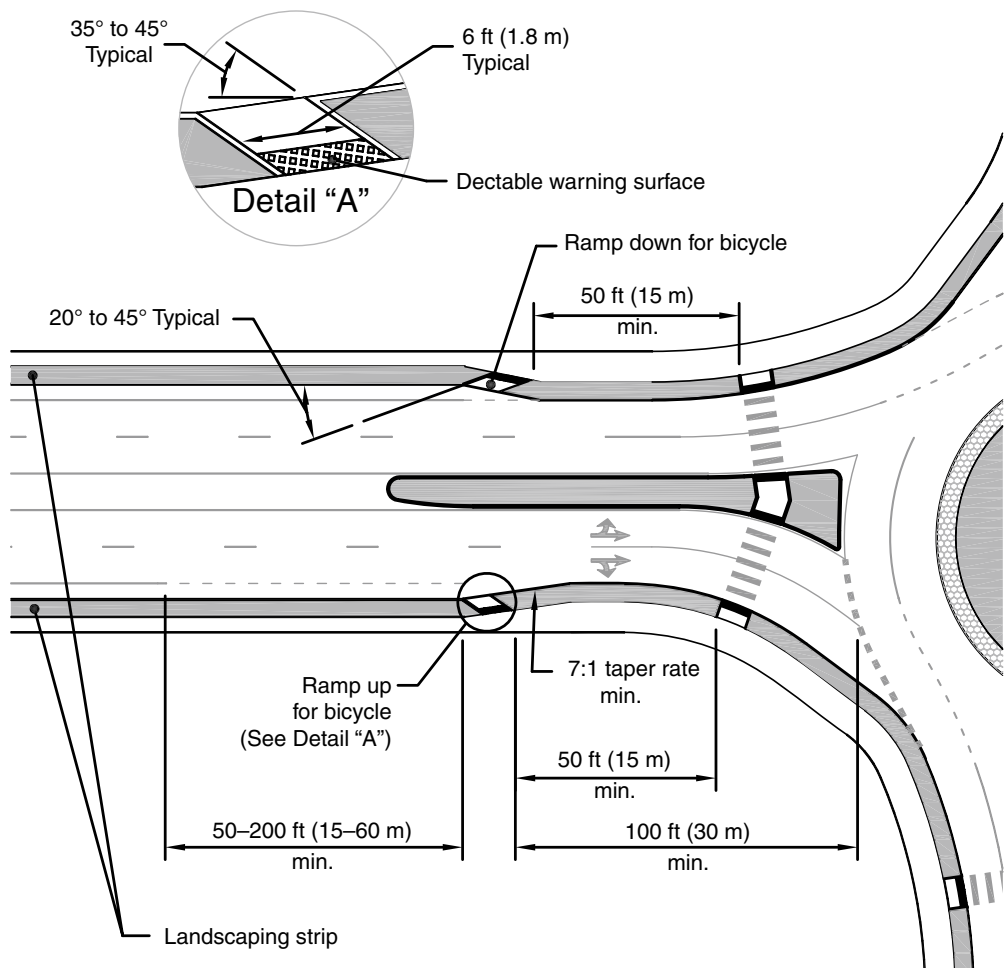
Typical Layout of Roundabout with Bike Lanes (4)
